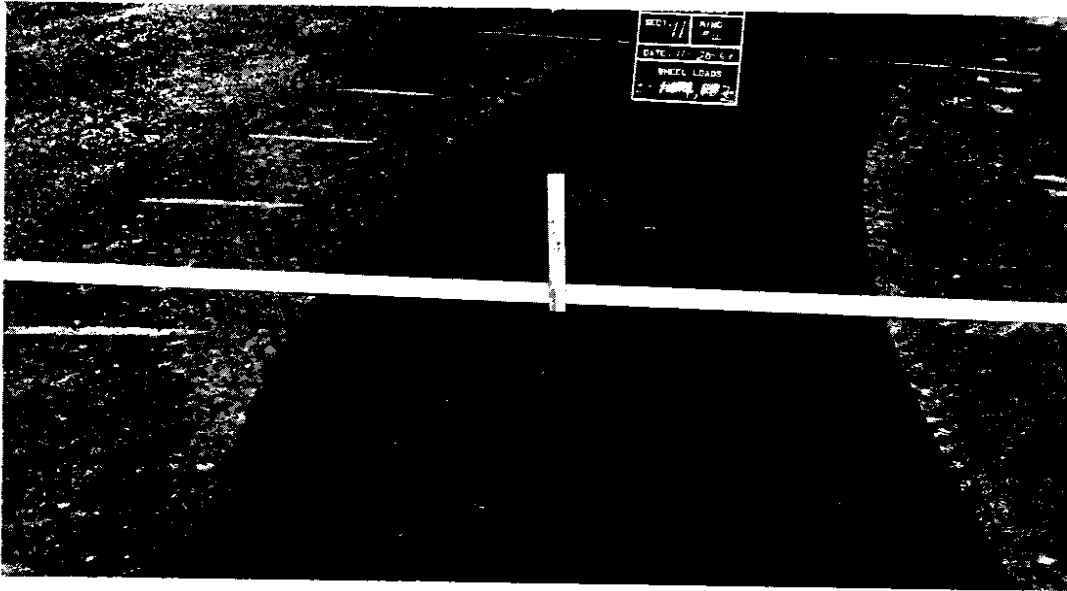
PERMANENT DEFORMATION OF ABOUT 3/4 INCHES IN SECTION 11 AFTER 104,187 WHEEL LOADS-- NOVEMBER 20, 1968. THE LIGHTING DOES NOT SHOW UP THE CRACKS.
